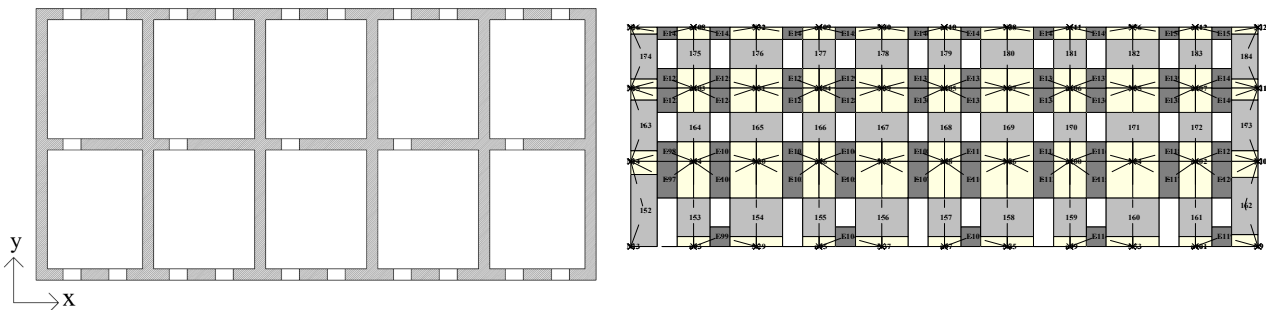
Model D5: 5 units two-rooms aggregate, plan and front façade
